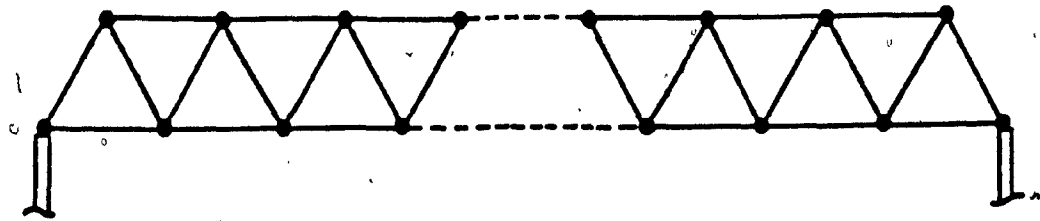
THE RING TRUSS IS SUPPORTED AT ITS LOWER SURFACE, THE TRUSS HAS CONSTANT DEPTH AND IS FLAT.
